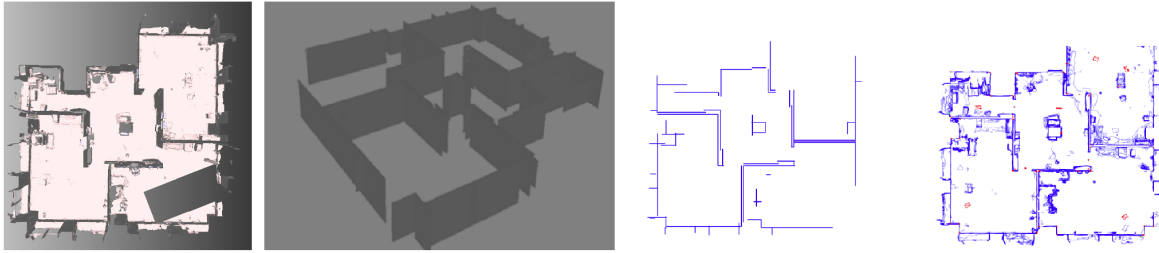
First: 3D model of building B3. Second: computed flat walls. Third: drafting style floor plan. Fourth: pen-and-ink style floor plan.
